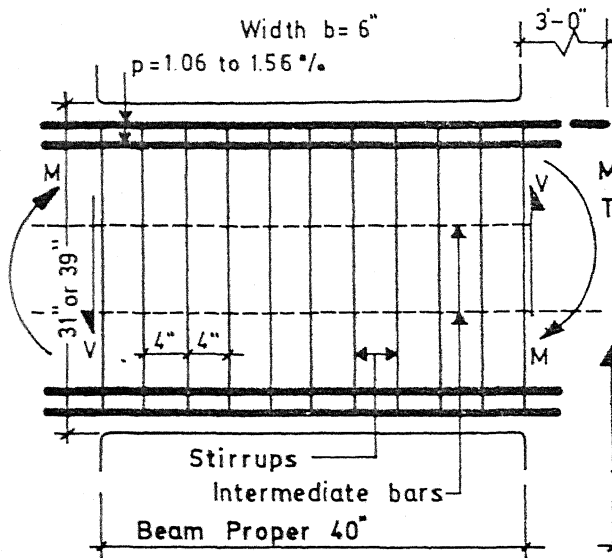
The Dimensions, Reinforcement and Loading of Coupling Beams
